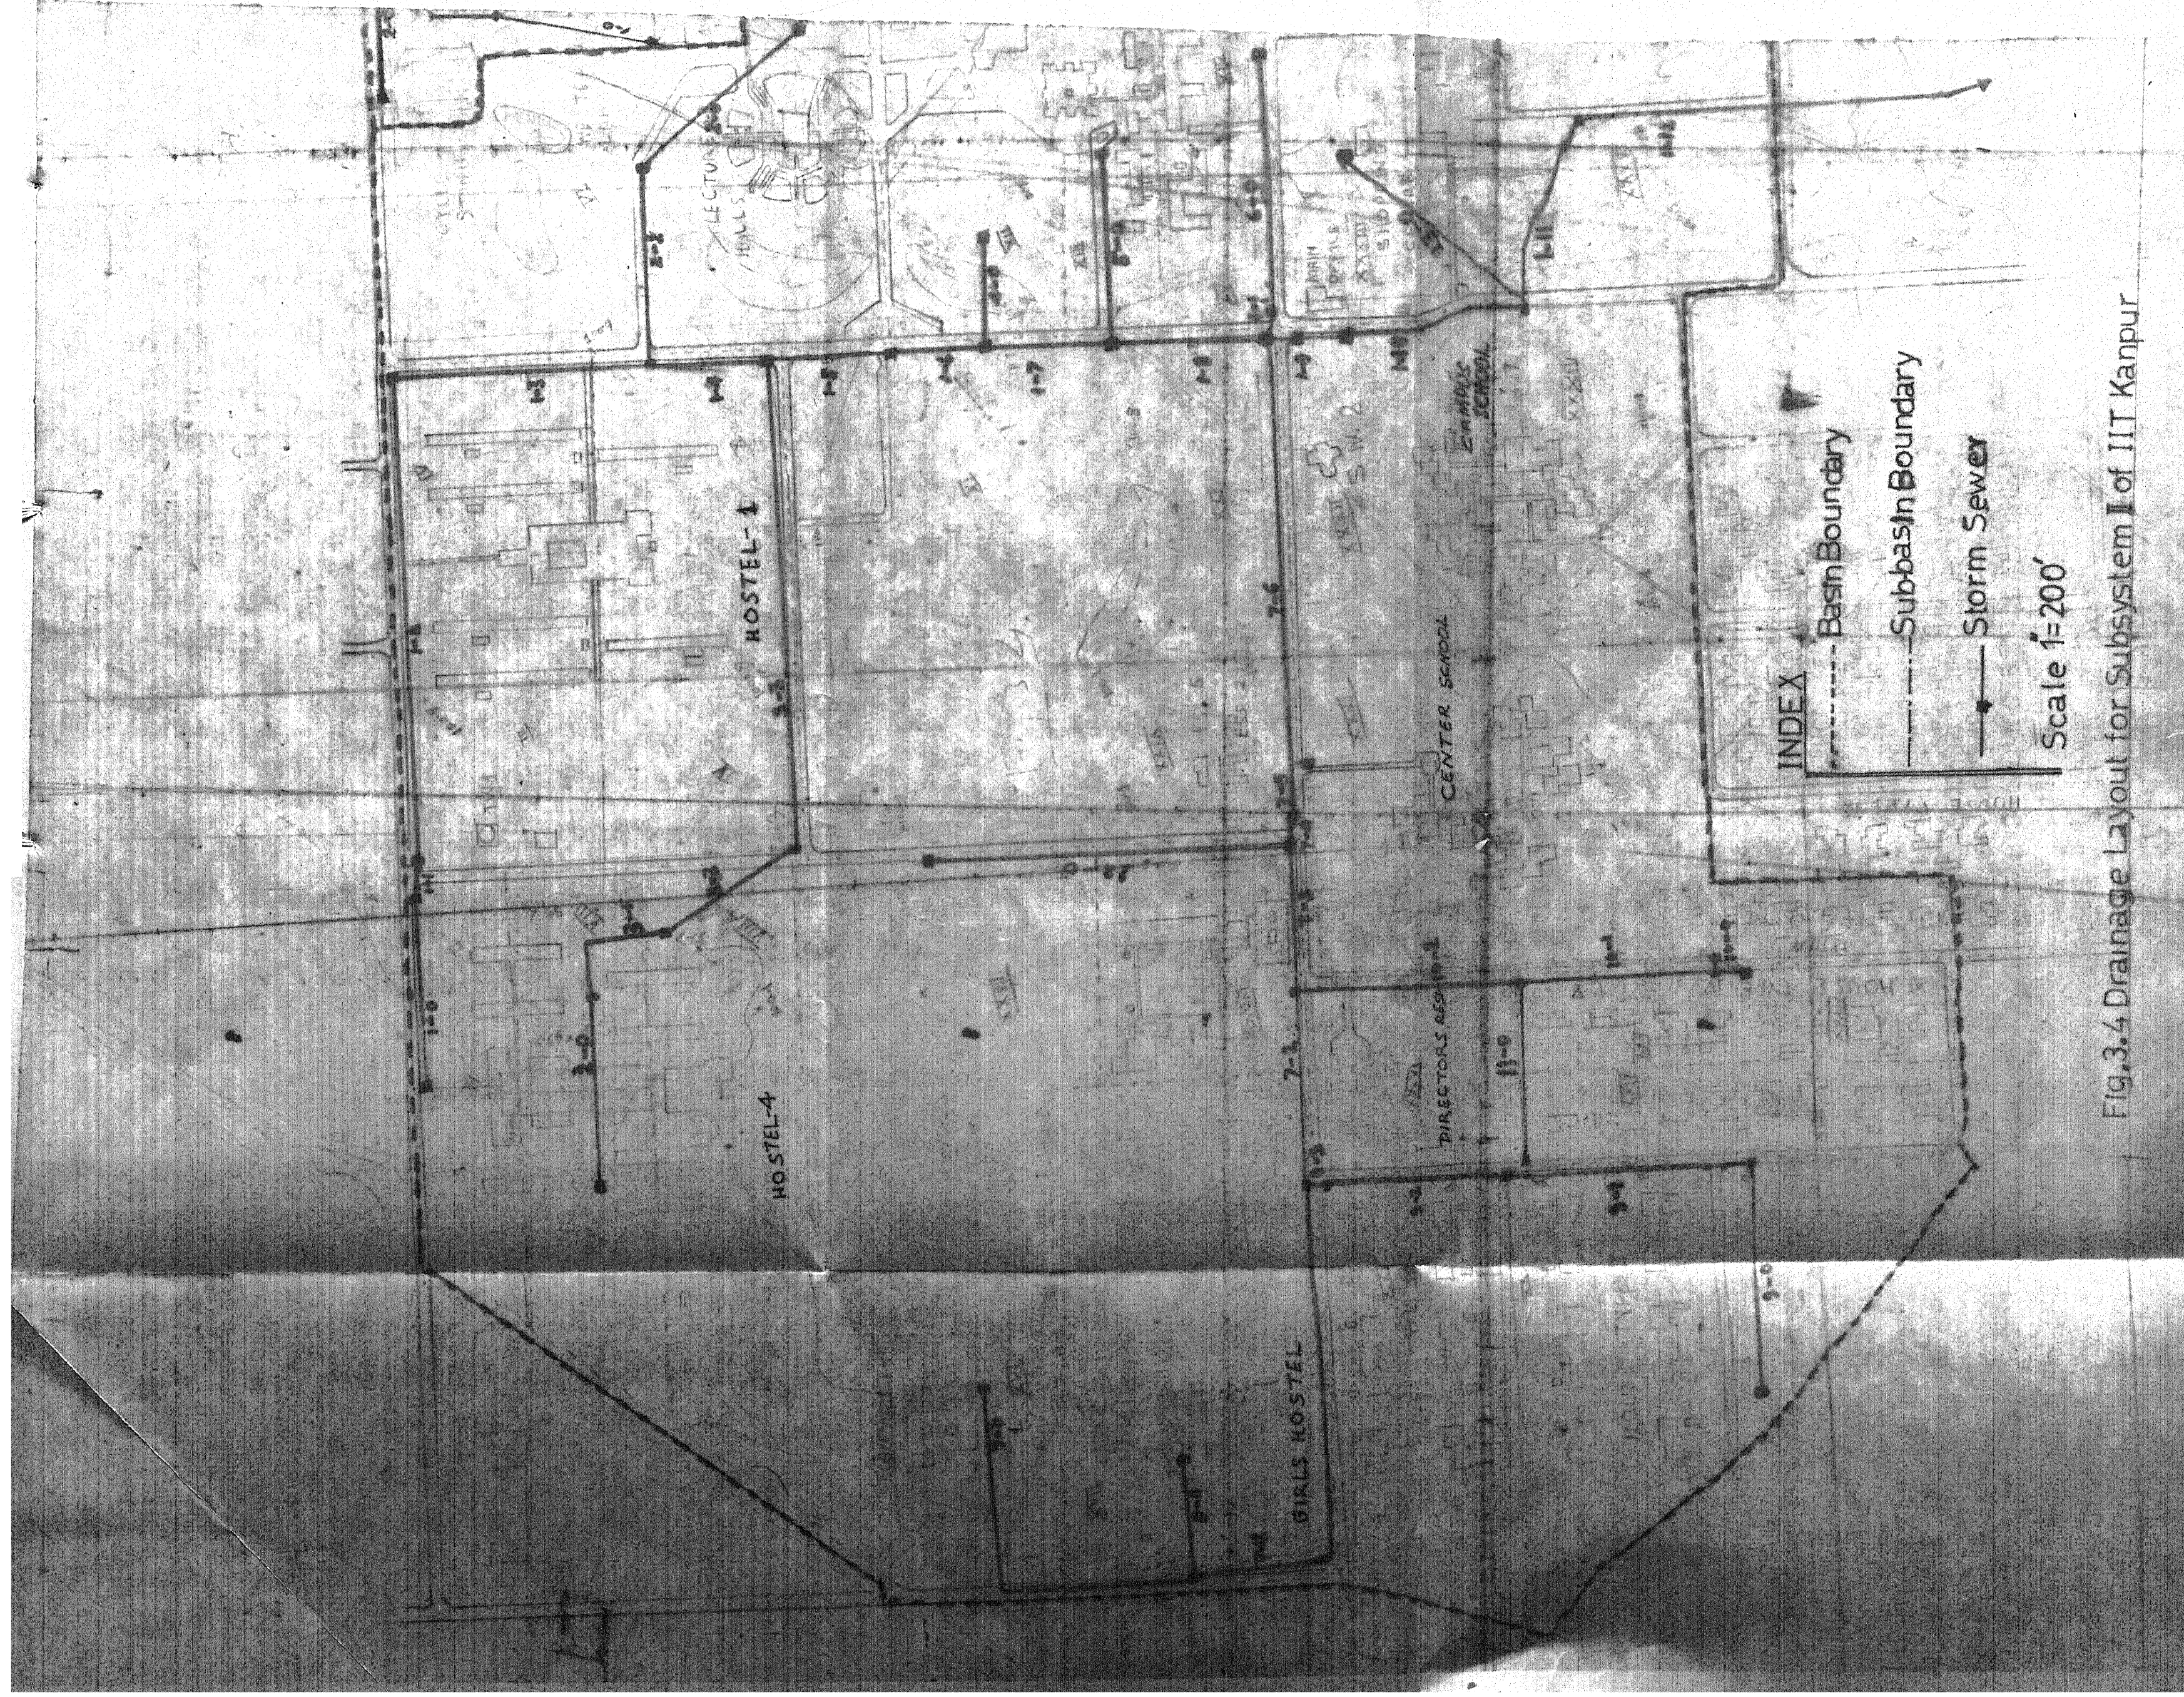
Drainage Layout for Subsystem II of IIT Kanpur
